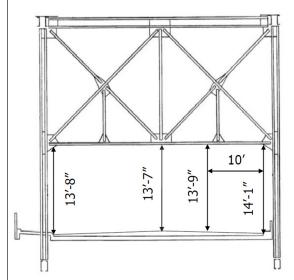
Cross-section view of through truss bridge showing vertical clearances.
